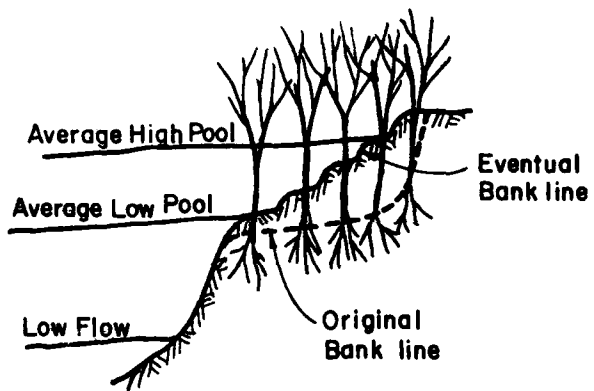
Willow stabilization of beaches at higher pool levels after additional bank failure.
